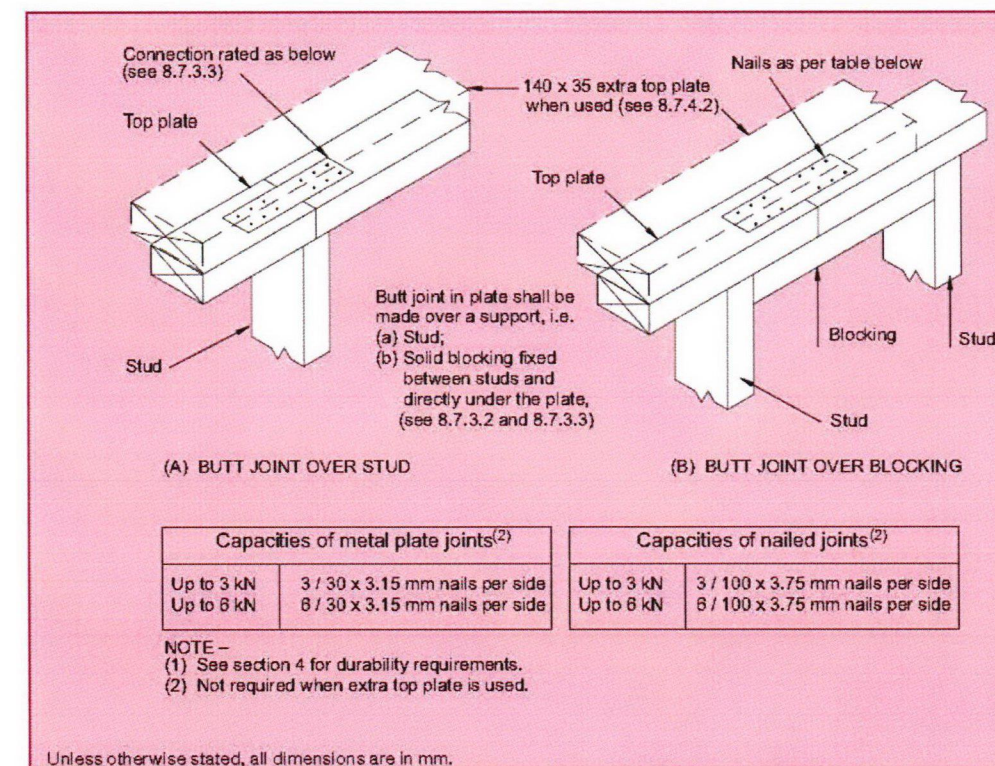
Connecting top plates in line – Walls containing bracing (see 8.7.3.3)
